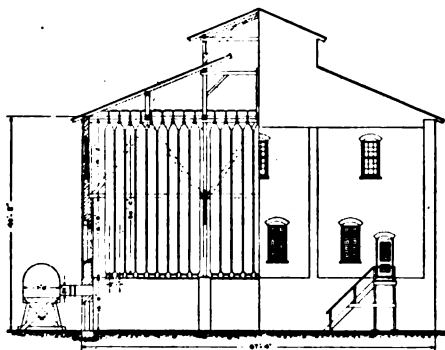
SECTIONAL END ELEVATION OF BAG HOUSE.
